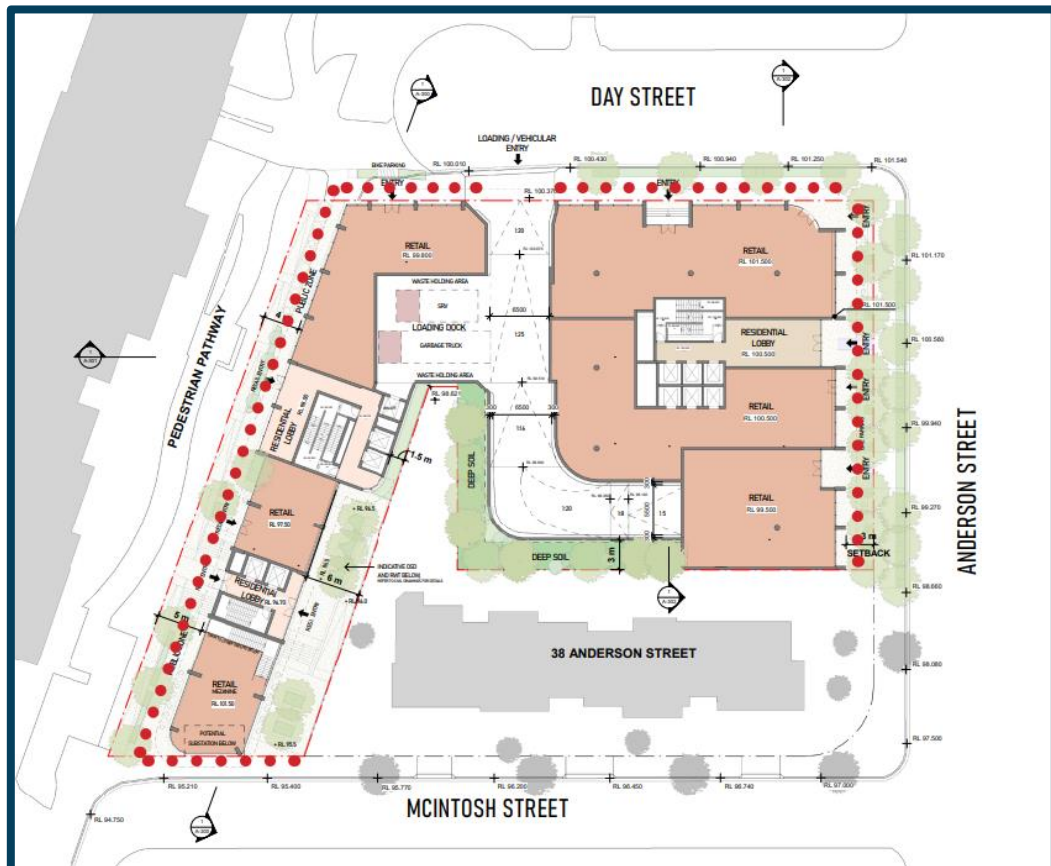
Proposed ground floor plan (source: Drew Dickson Architects)
